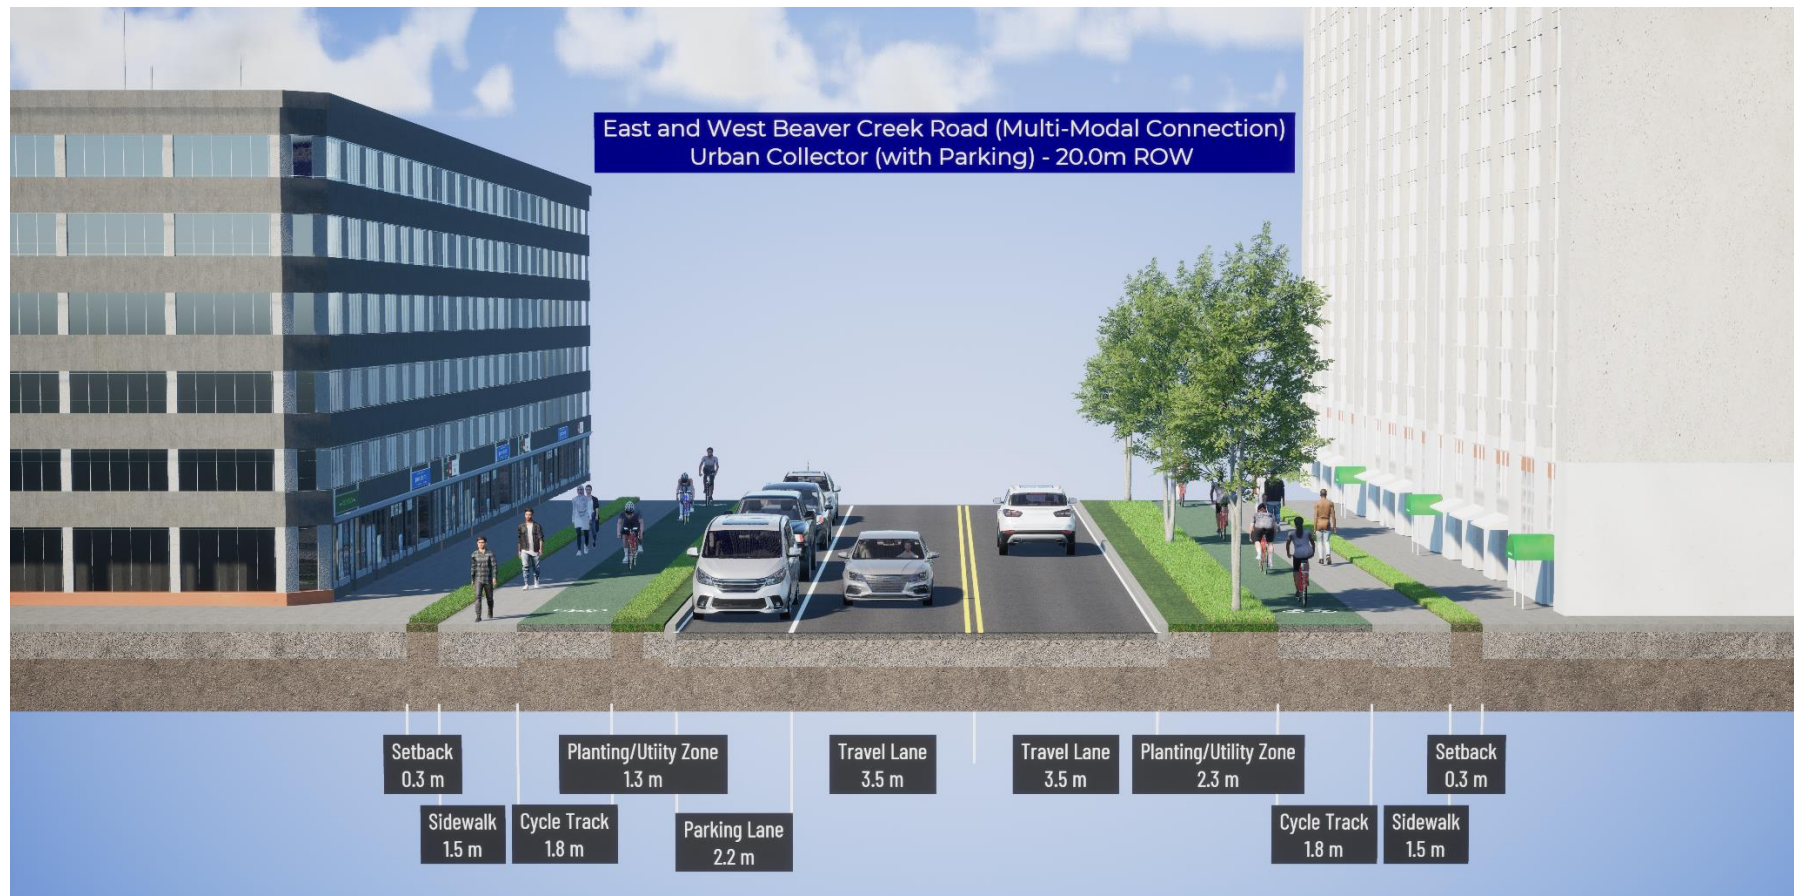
Typical Road Cross-section – East and West Beaver Creek Road
